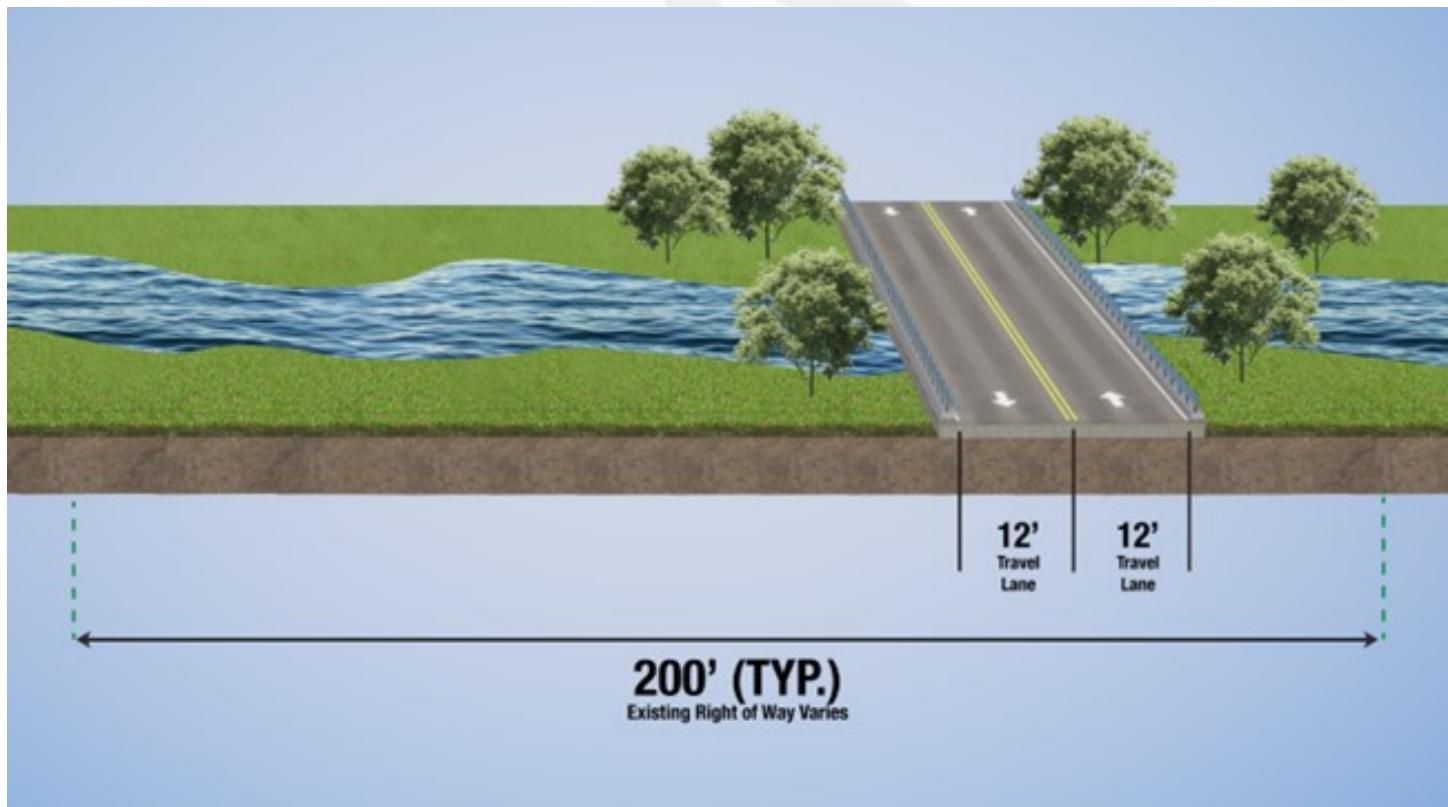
S.R. 70 Typical Section for Existing Bridges Over Whidden Creek and Joshua Creek
